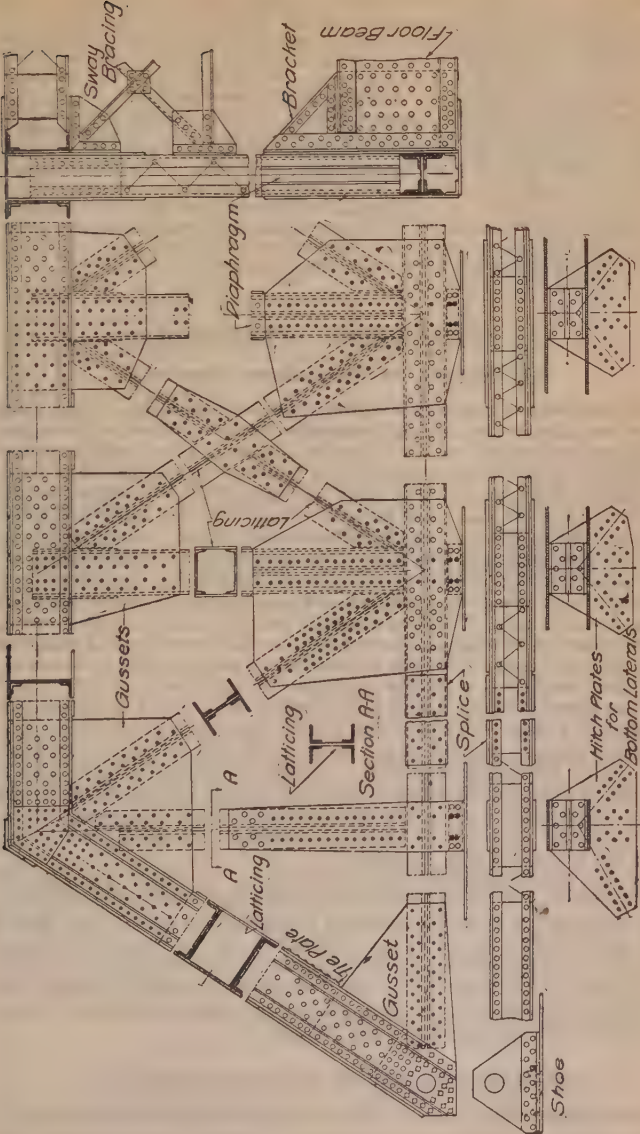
Partial Detail Drawing of a Through Riveted Railroad Bridge.
